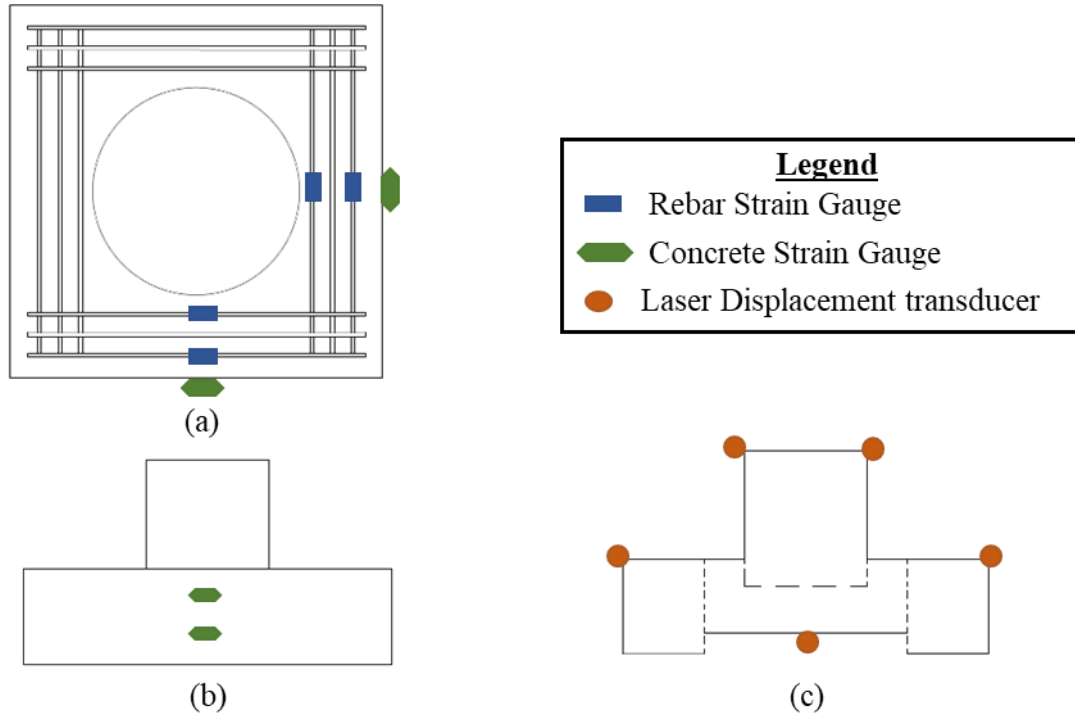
Instrumentation scheme for socket connection: (a) pile cap bottom view, (b) cap elevation, and (c) specimen elevation through centerline.
